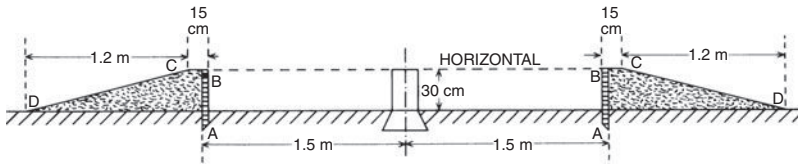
A 'turf wall' as used in the British Isles to provide shelter for raingauges on exposed sites. A-B represents the vertical retaining structure, B-C the level portion of the turf wall and C-D the sloping portion of the wall (gradient 1 in 4). (© Crown copyright 1982, the Met Office)
